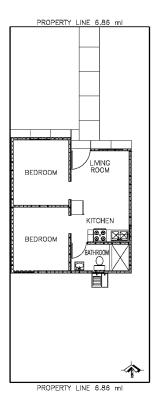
Architectural plan, Commercial model (MC), Fracc. Places of Puebla, Mexicali
